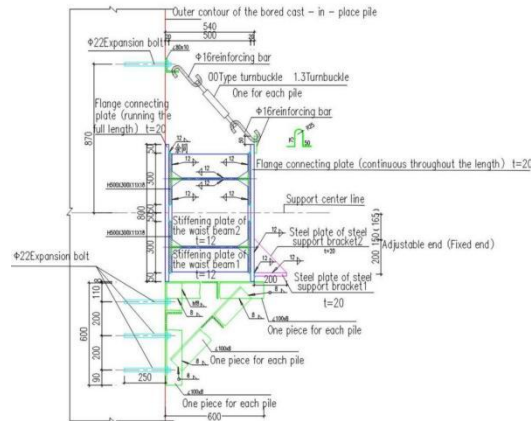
Design Profile Diagram of Steel Support Bracket Steel Plate
